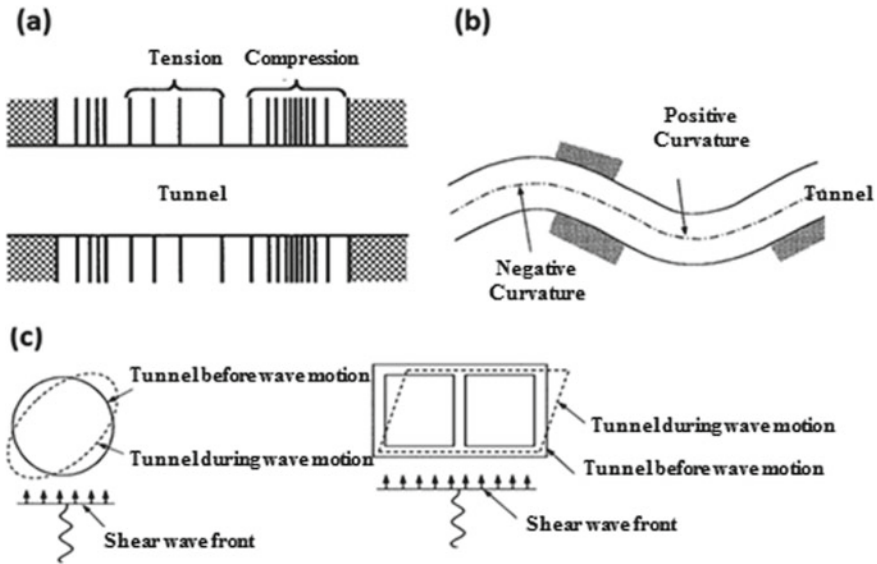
Tunnel deformation: a axial compression and extension, b longitudinal bending, c Ovaling and racking [4]
